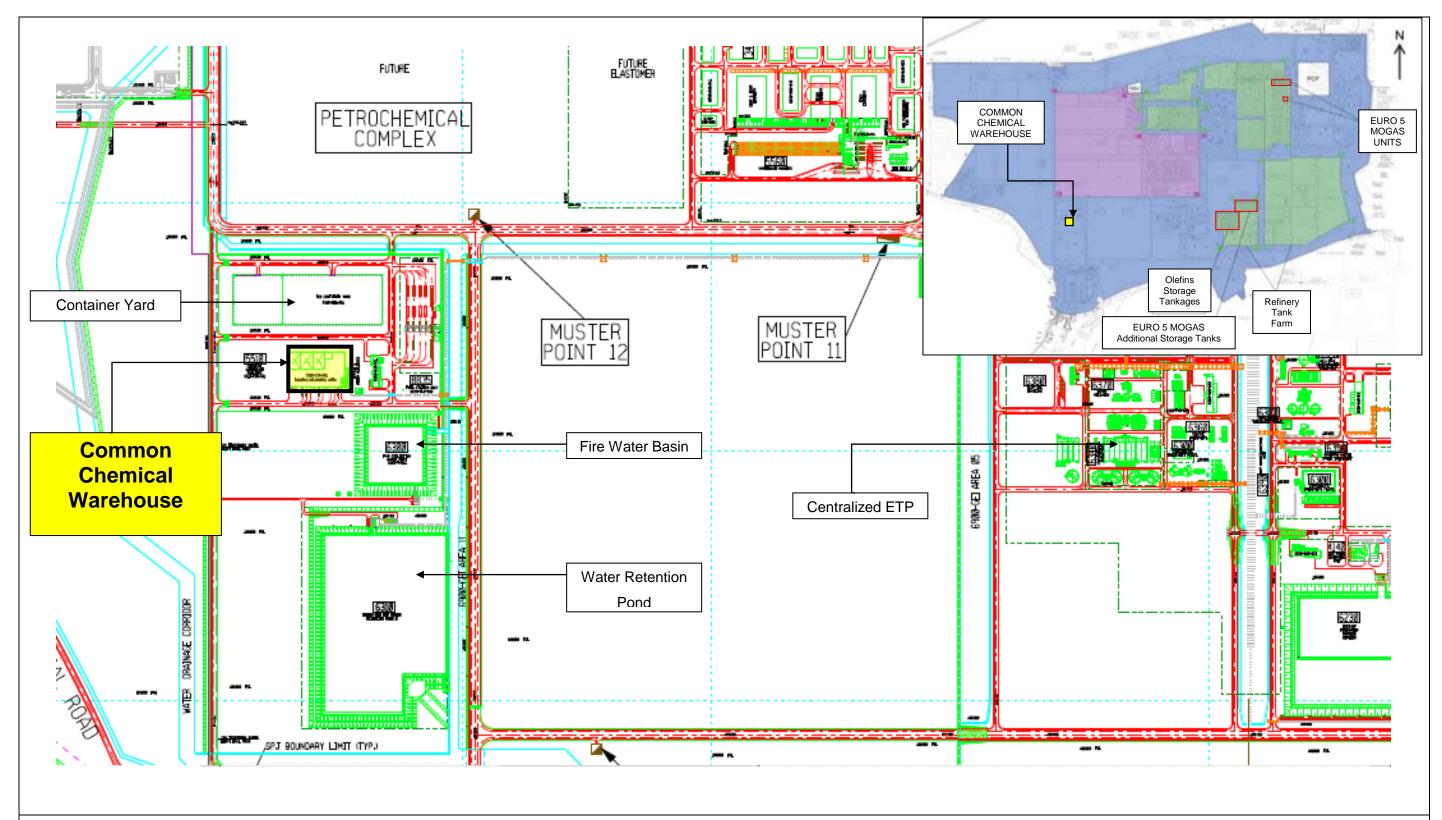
Common Chemical Storage Warehouse Location Within RAPID Plot Plan Layout.
